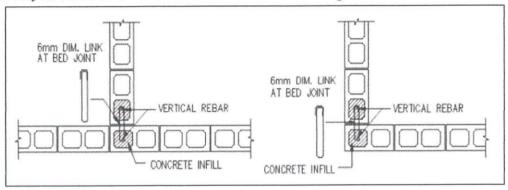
Installation of Rebar Link (Source: Modul Pemasangan CMU Projek PPR Tanjong Karang)
